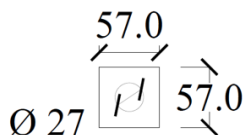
Dimensions of the steel plate washer in millimeters.
